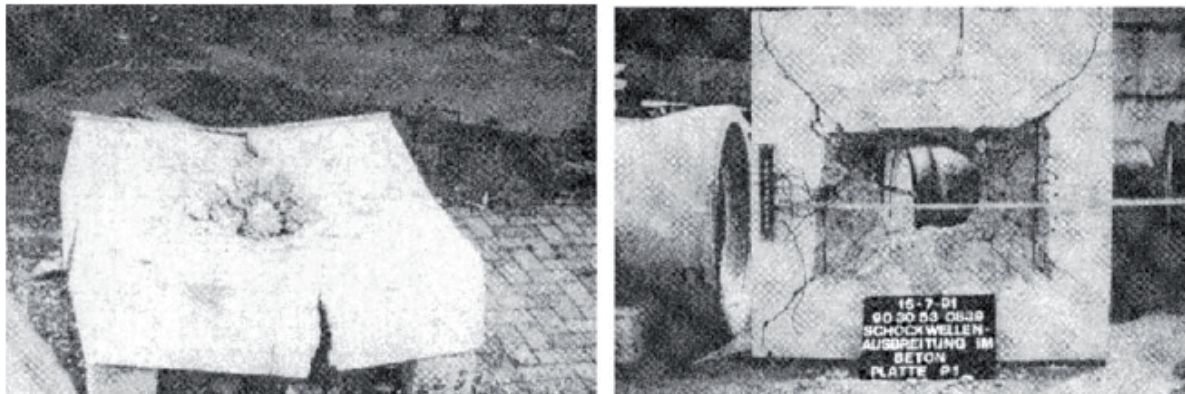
Damaged slab (Rabzuk and Eibl 2006) a) Top view; b) Bottom view
